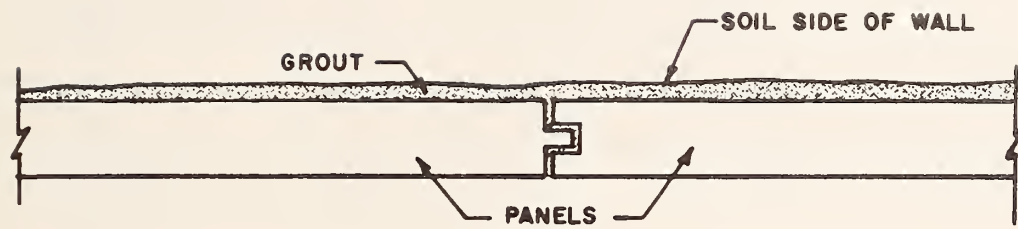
Pre-Cast Slurry Walls - Typical Joint Details
